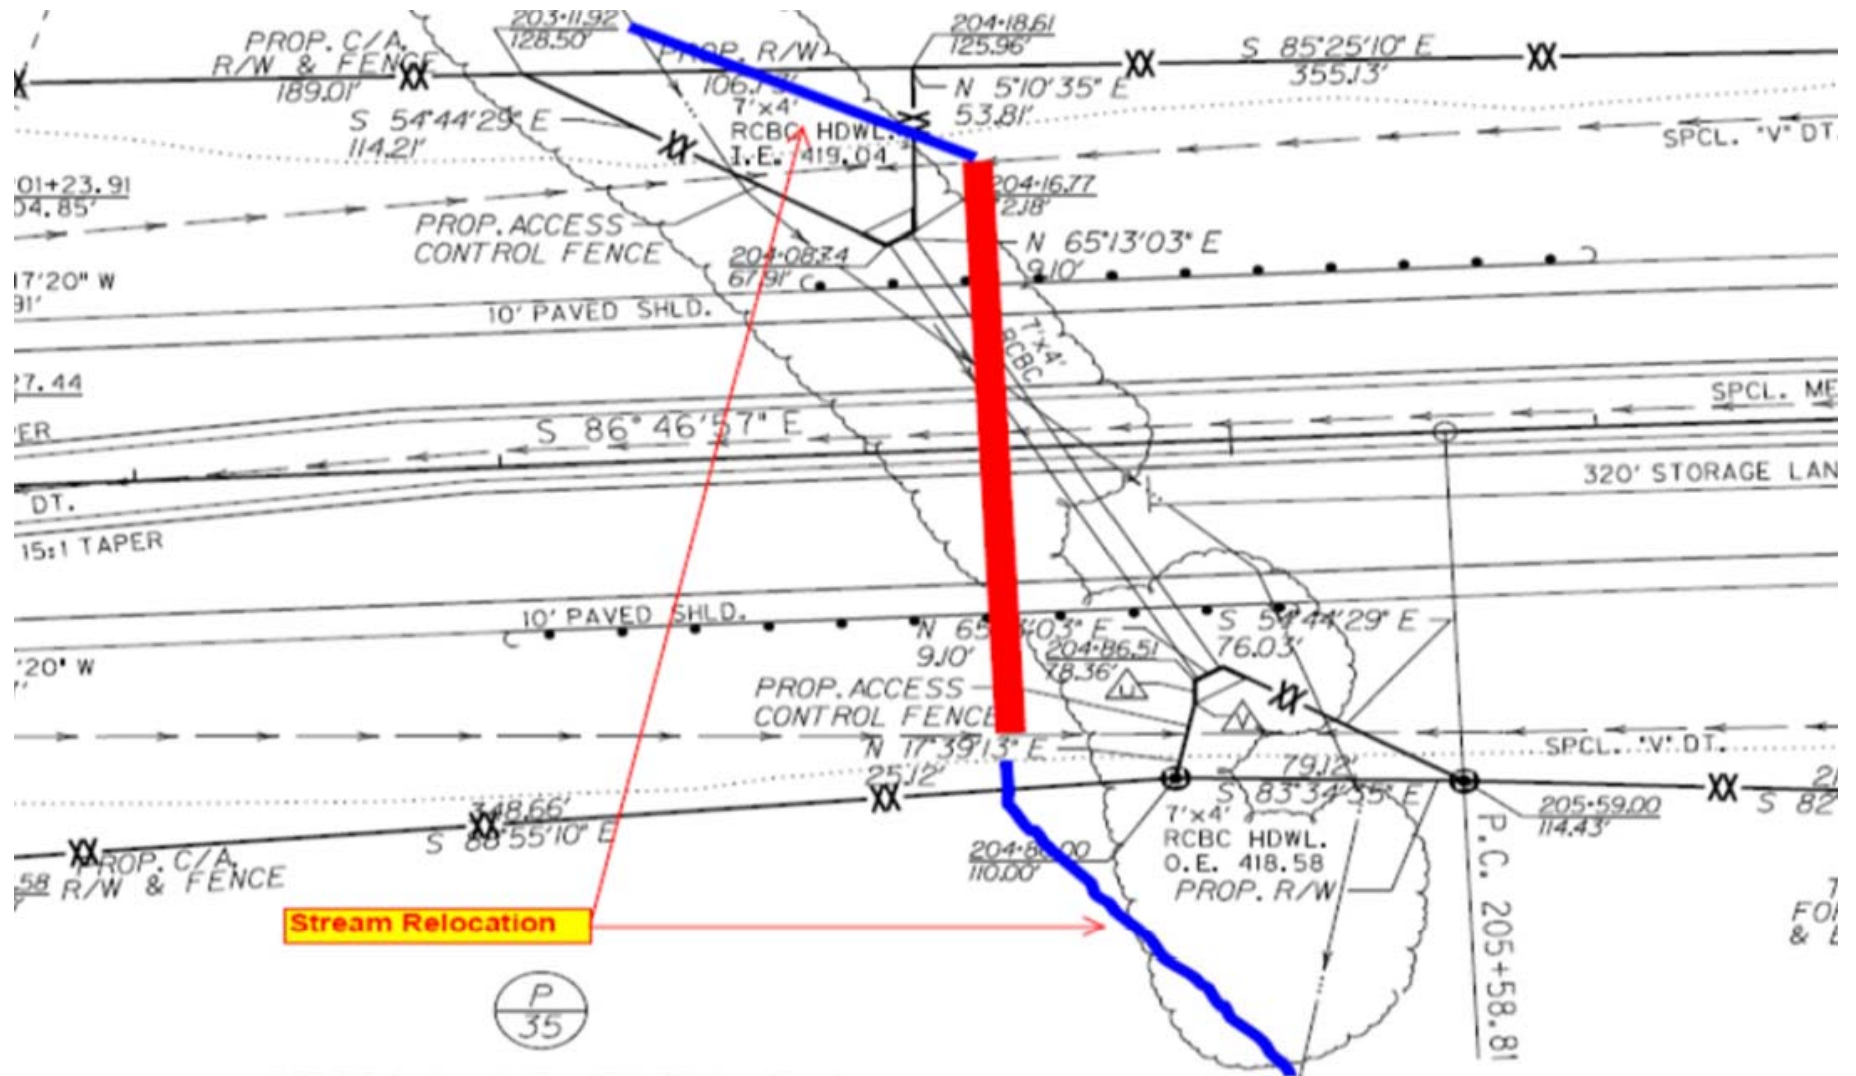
189+00 Culvert Modification West of Industrial Boulevard
